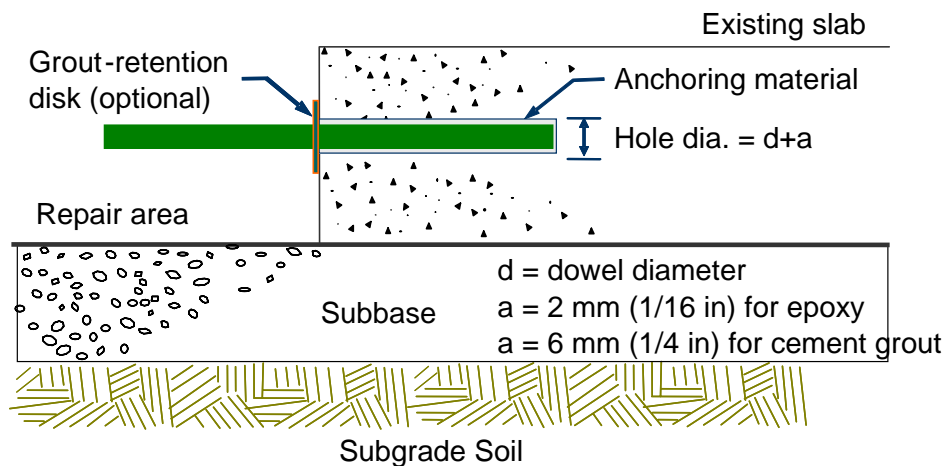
Illustration of dowel bar anchoring in slab face.
